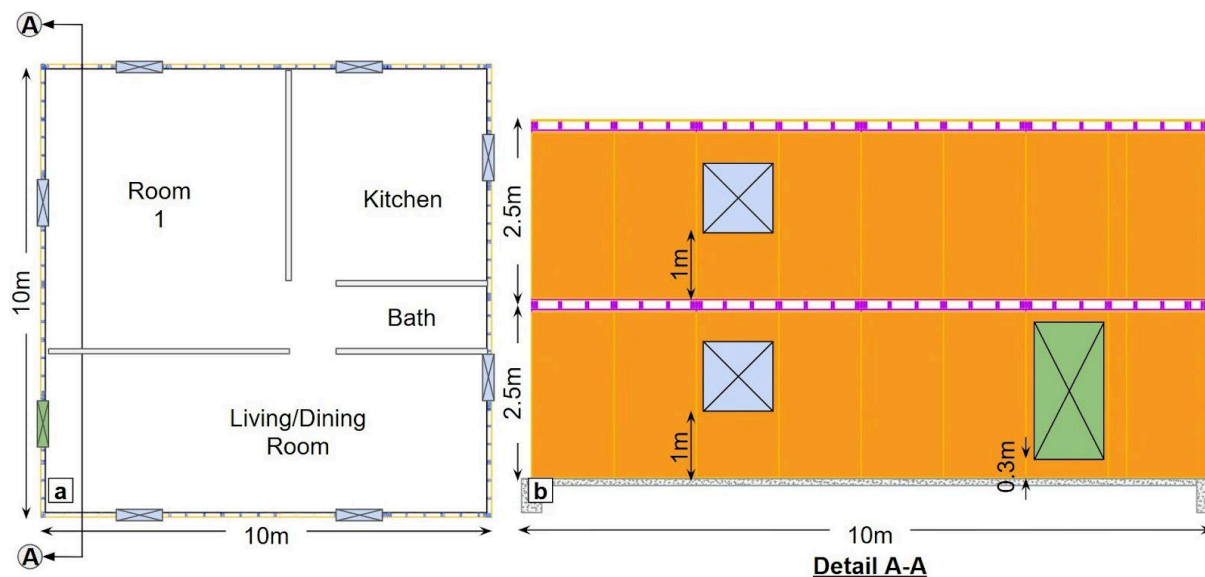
Timber house typology: (a) First story plan layout and (b) Representative elevation view of a two-story house.
